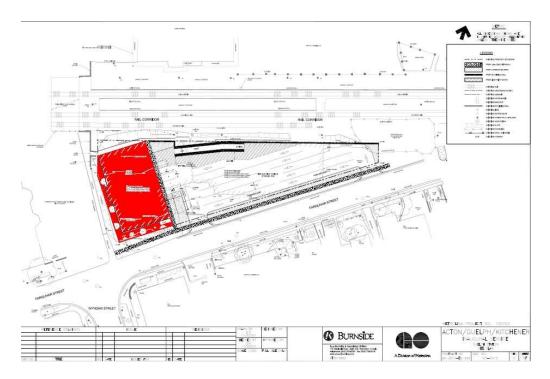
Site Plan indicating the Drill Hall building with landscaped frontage and side yard at the west end of the property currently known as 72 Farquhar Street.
